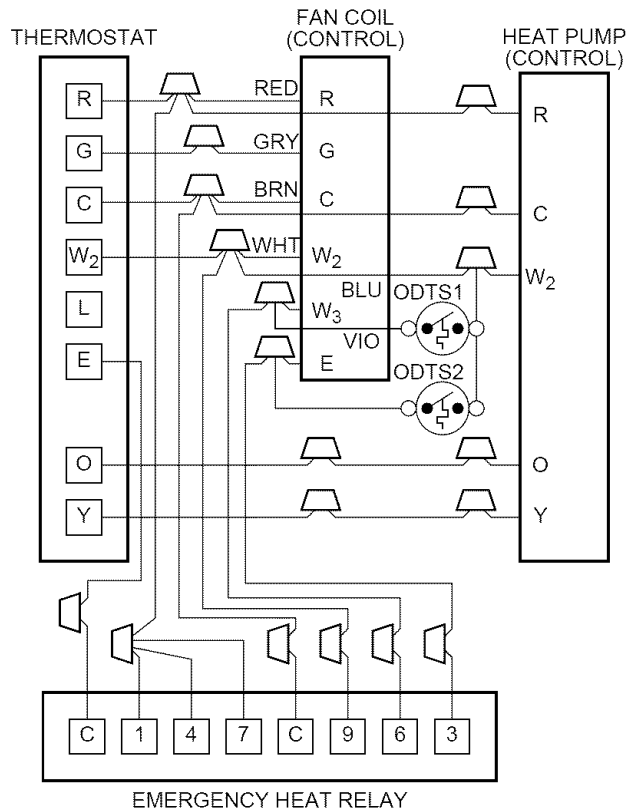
Wiring Layout Heat Pump Unit (Cooling and 2-Stage Heat with 2 Outdoor Thermostats)
